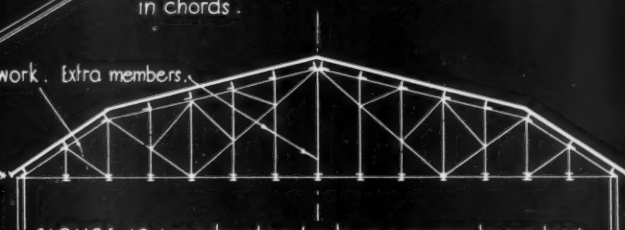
construction for truss carrying heavy load at lower as well as upper chord
